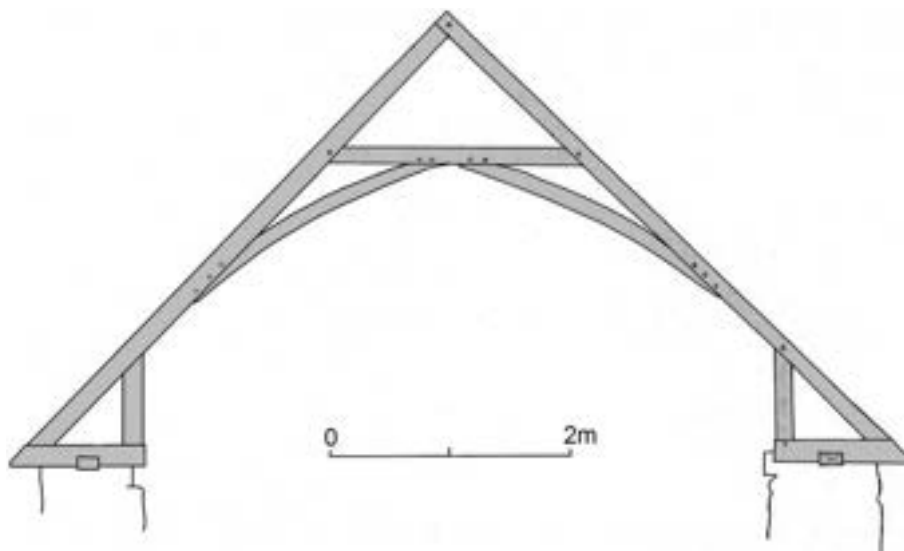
A typical coupled rafter truss belonging to the second nave roof.
